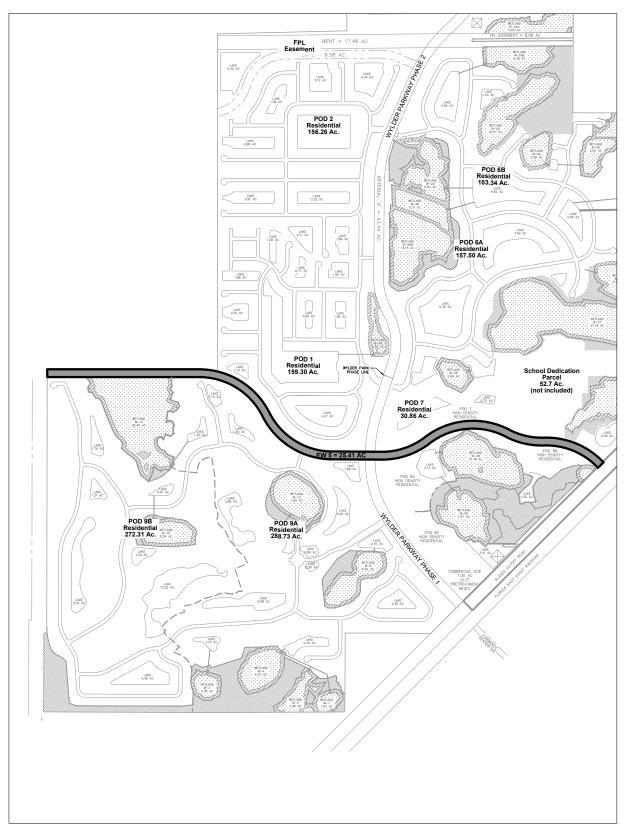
SITE PLAN LTC RANCH — POD 9
